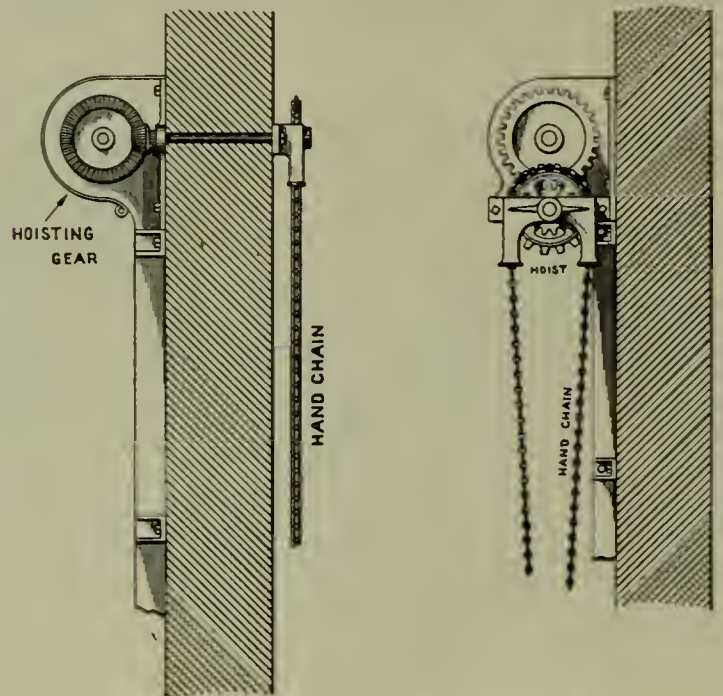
DETAILS OF HOISTING MECHANISM FOR OUTSIDE AND INSIDE SUPPORTED DOORS.
